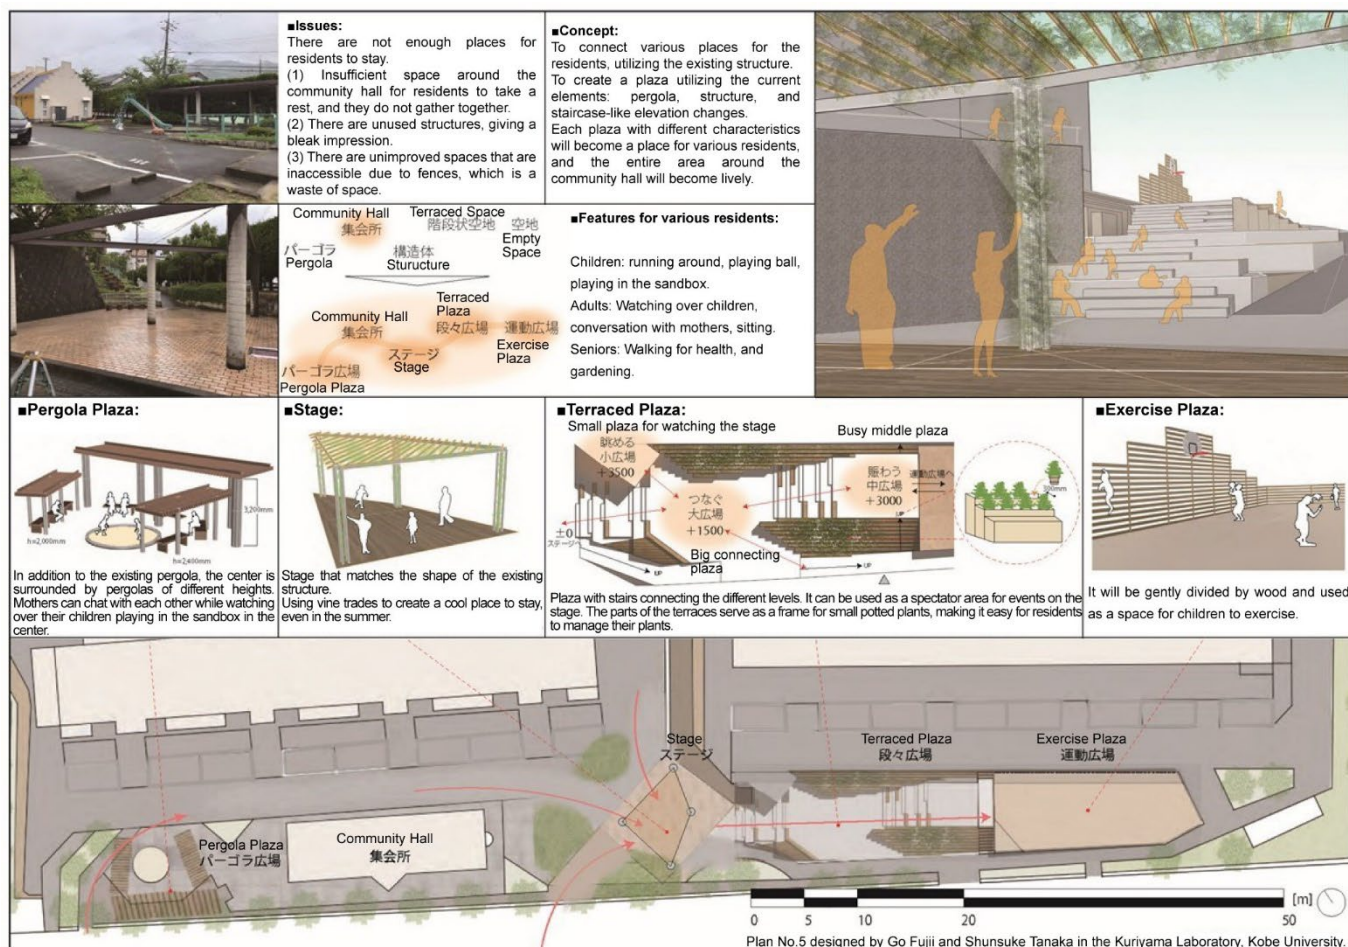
Renewal Plan in the Surrounding Area of the Community Hall (集会所周りのリニューアルの提案)
